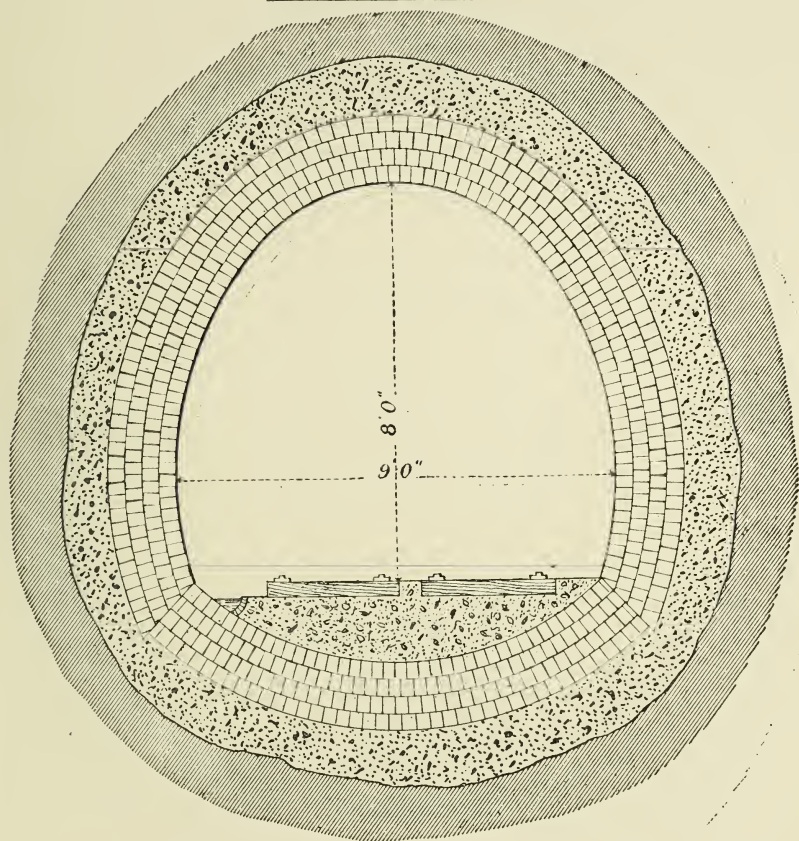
ARCHING FOR UNDERGROUND ROADWAY WHERE THE SIDES AND ROOF FORM PART OF AN ELLIPSE, AND THE FLOOR AN “INVERT” OR FLAT SEGMENT ARCH.
